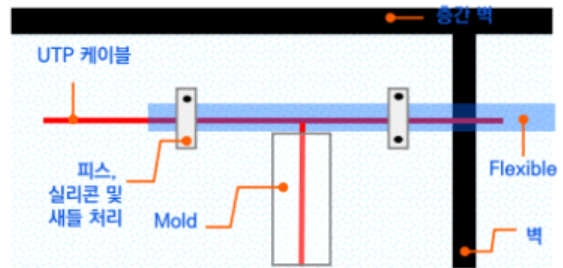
Wiring diagram for mounting the AP to the classroom wall
